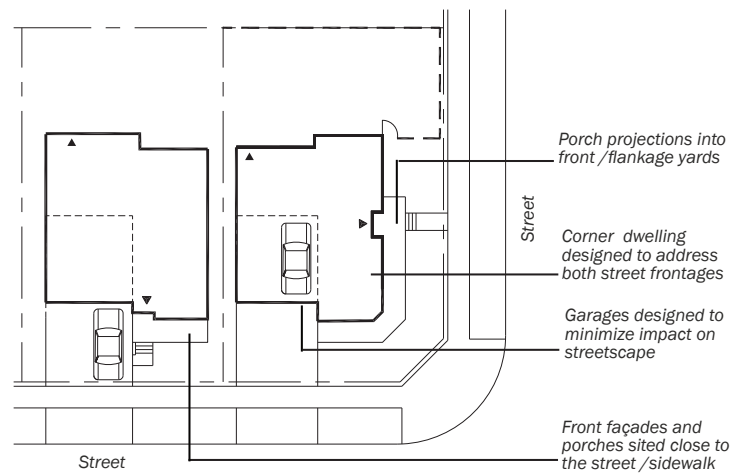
Conceptual plan layout for Single Detached Dwellings
